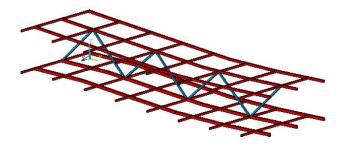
Link8 Elements for Steel Reinforcement and Shear Connectors
